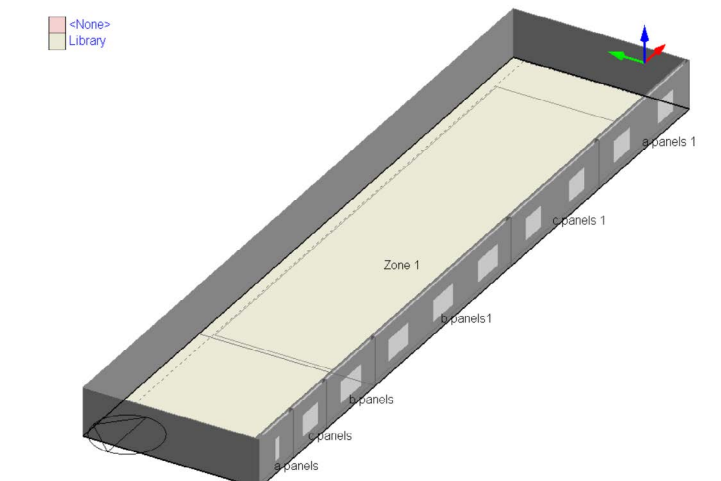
The first floor and the thermal zones, figure exported from Design Builder
